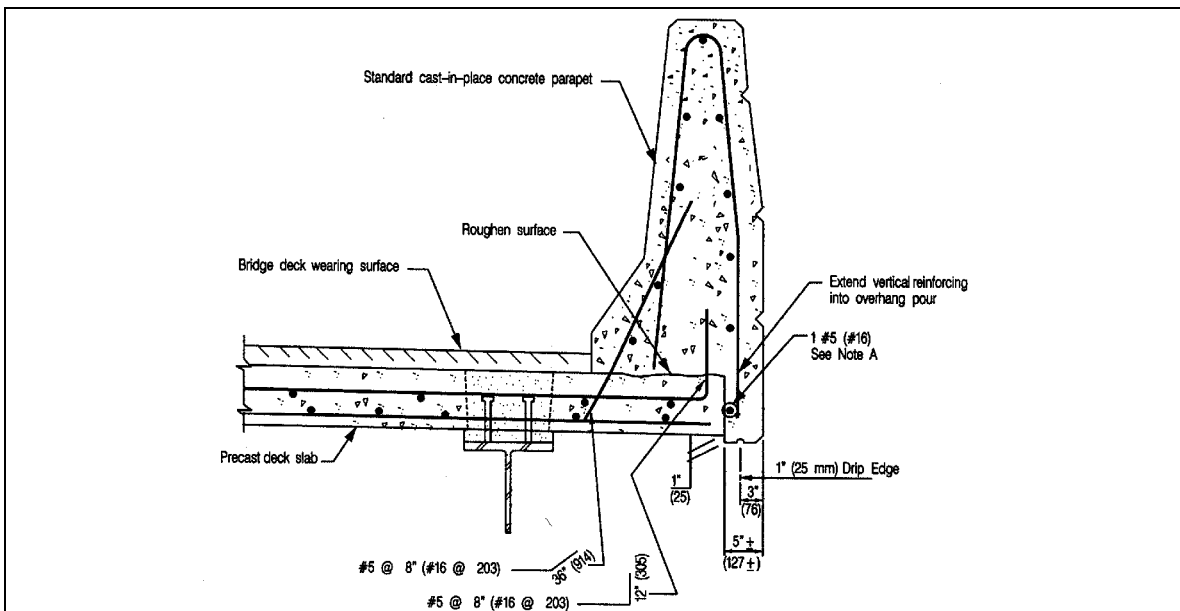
Typical deck overhang and parapet section (PCINER, 2002)
